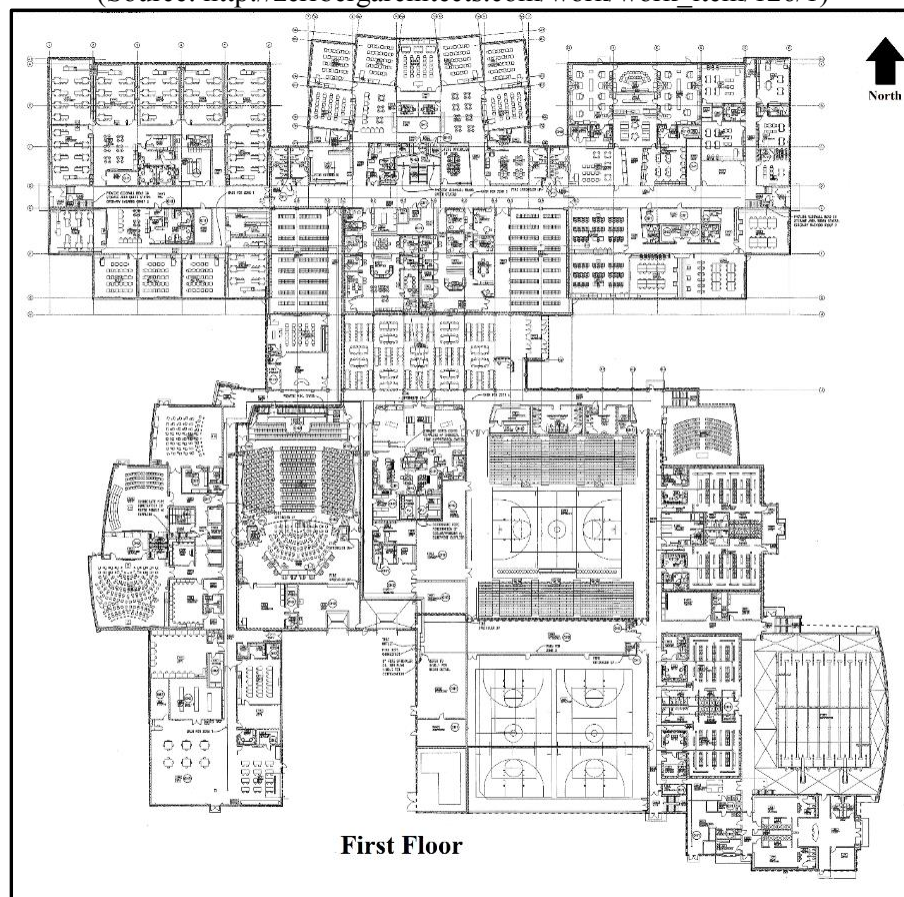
Judge Ronald N. Davies High School 1st Floor Plan
